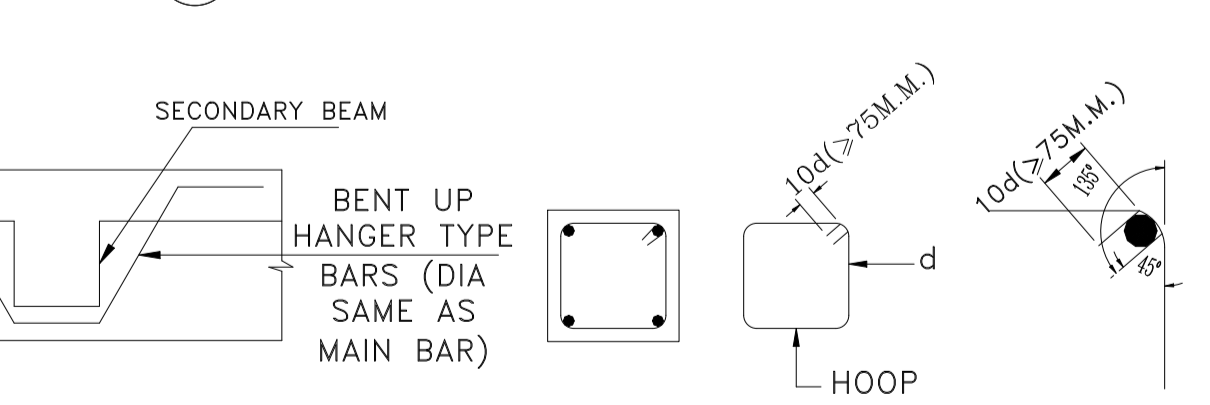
DETAILS OF COLUMN HOOK REINFORCEMENT
